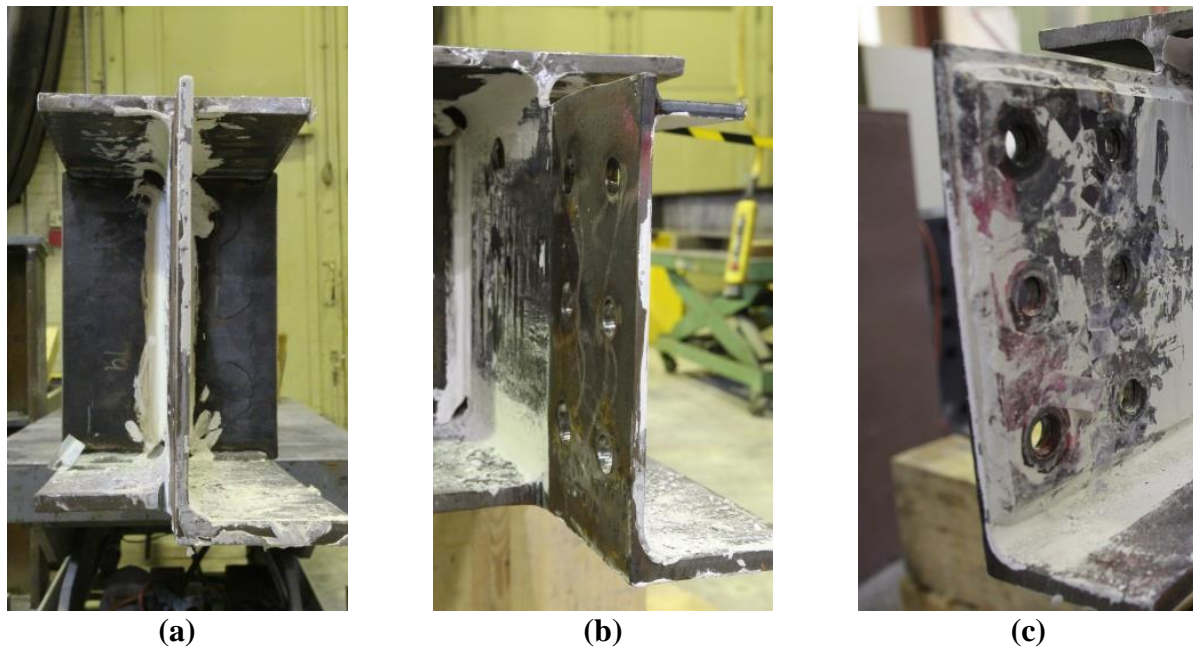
Out-of-plane deformation in beam (a) Specimen 1 (unreinforced); (b) Specimen 2 (horizontal stiffeners); (c) Specimen 3 (doubler plate)
